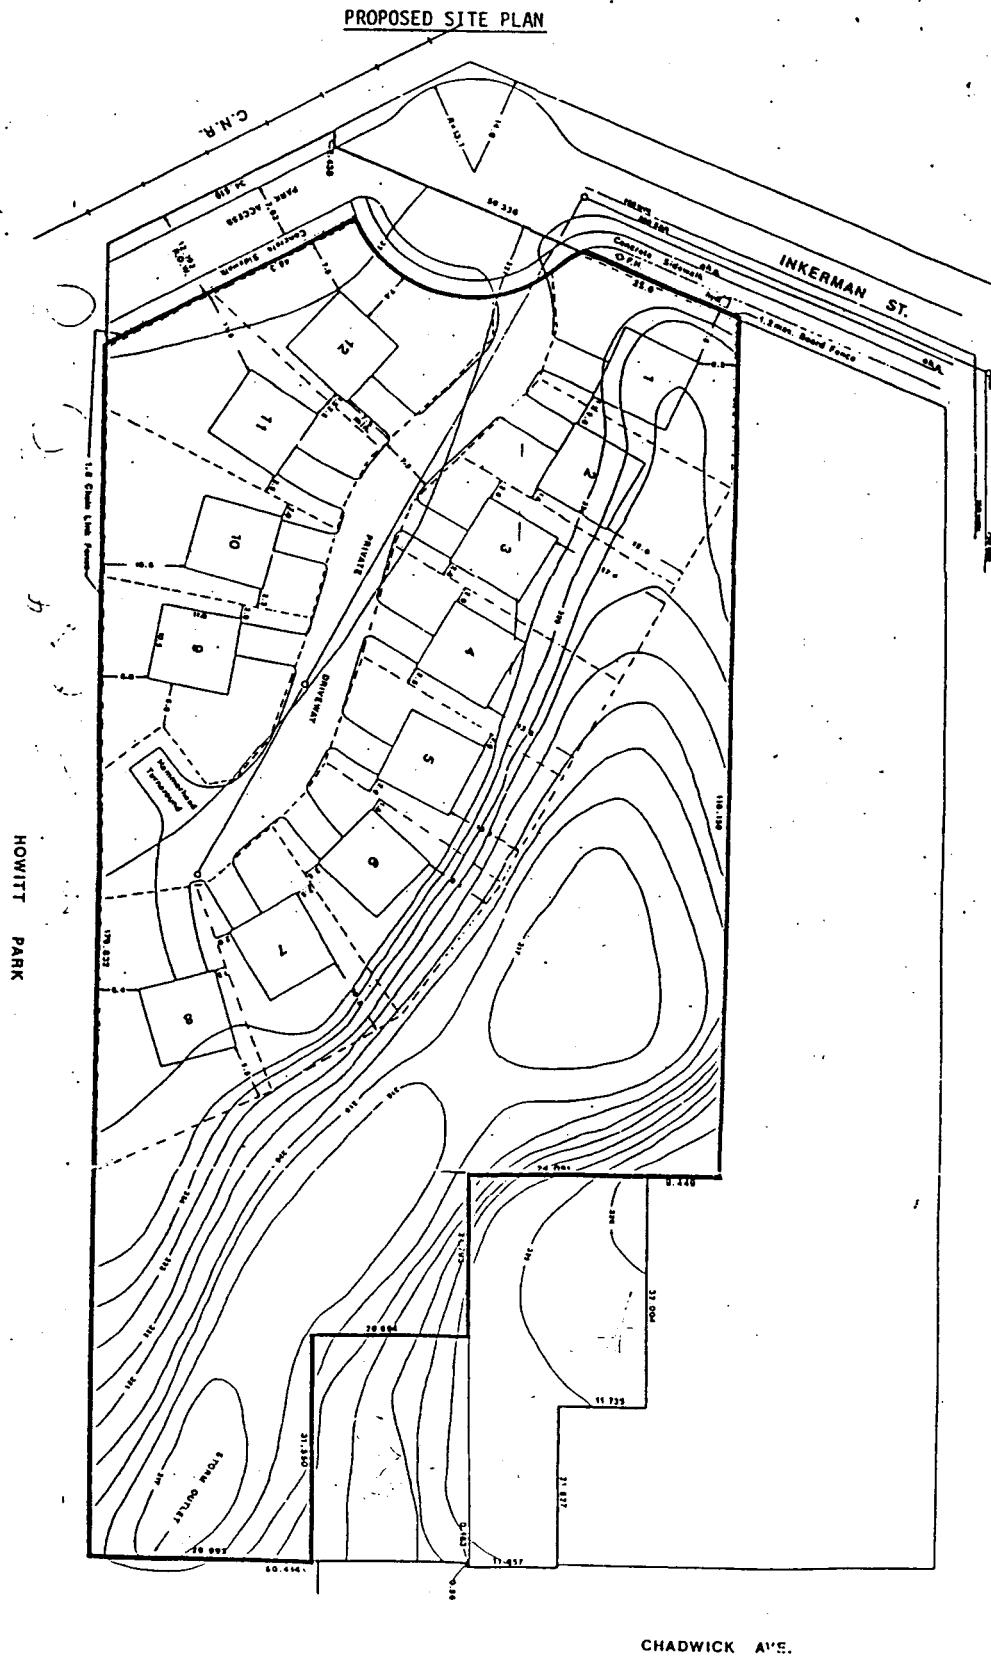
Residents' Proposed Site Plan with 326 Contour Line Highlighted
